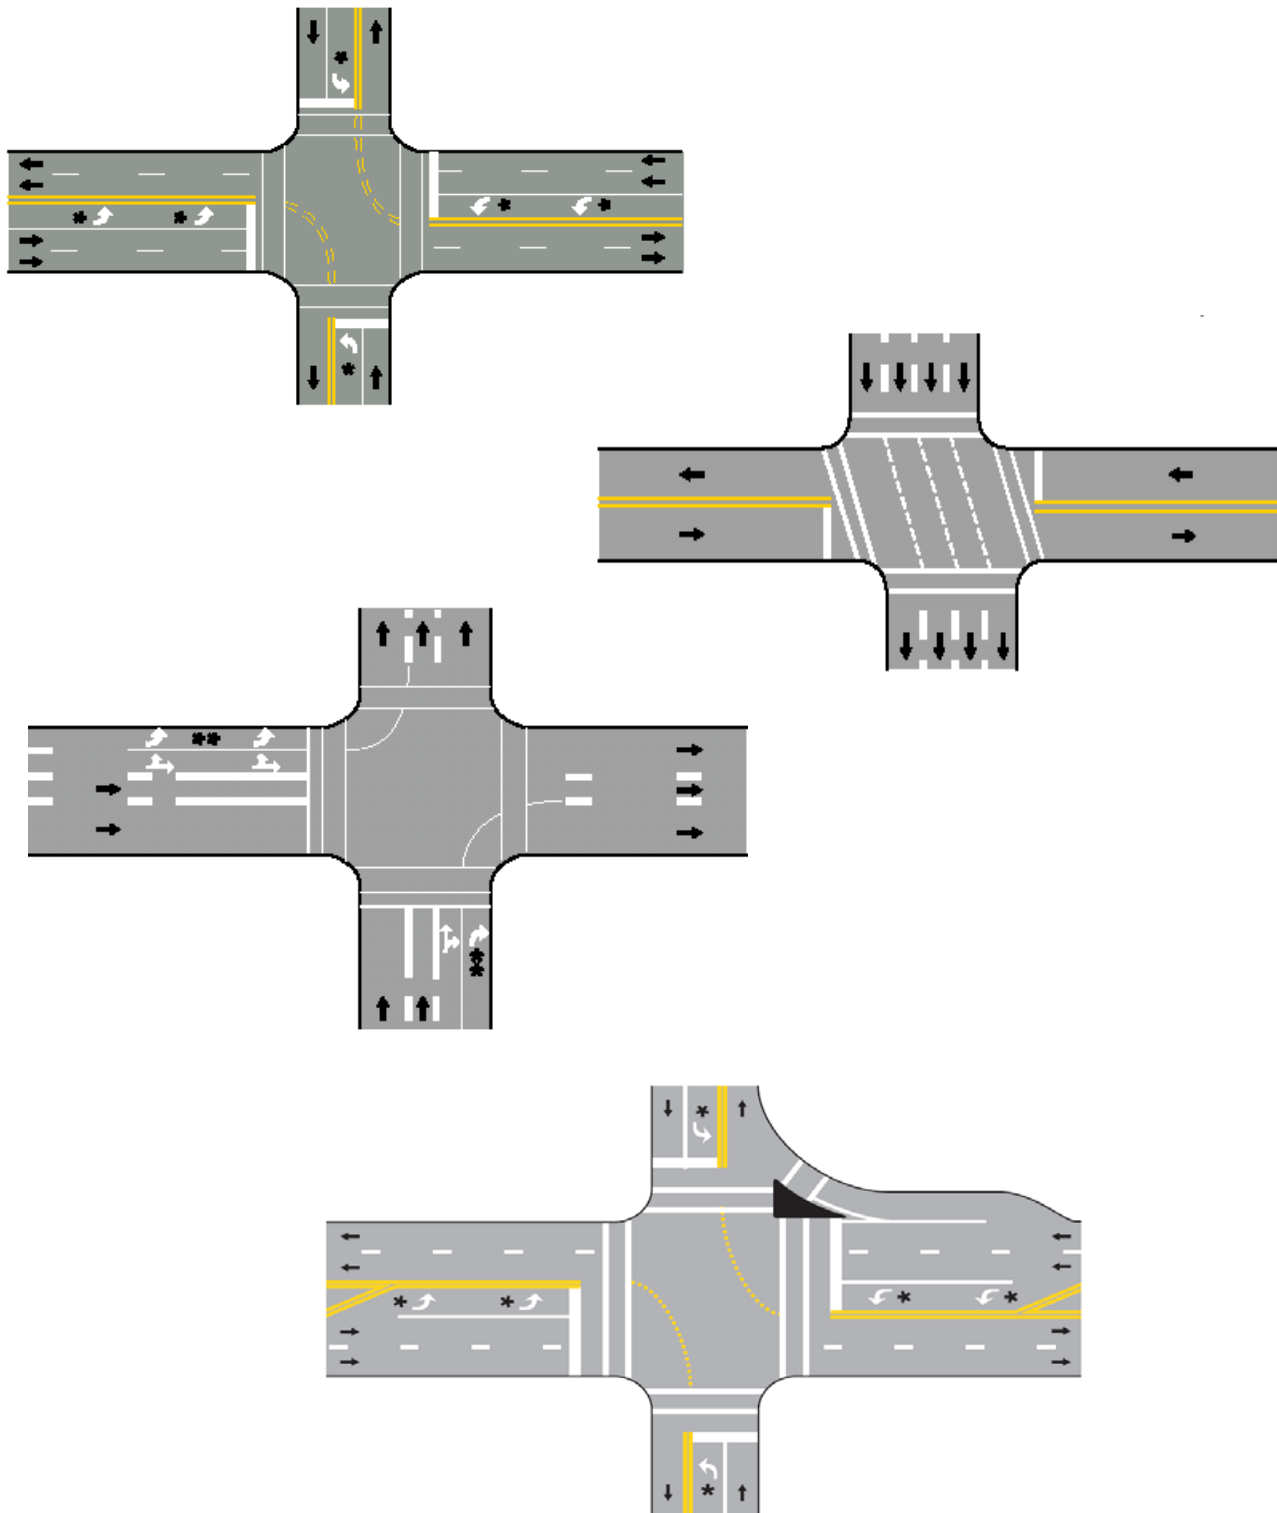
Typical Markings for Four Intersection Types (MUTCD)
